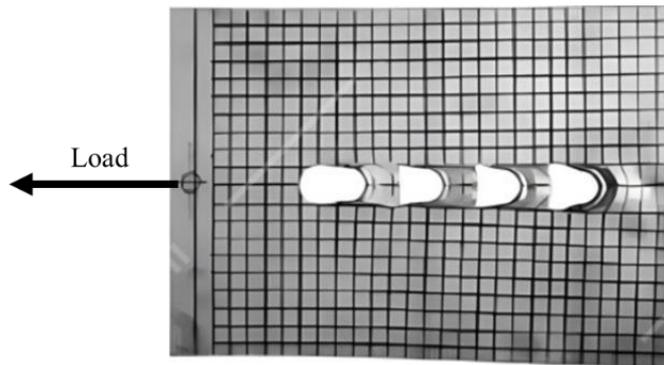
Bearing failure of the plate (Plakada basma hasarı) [19]
